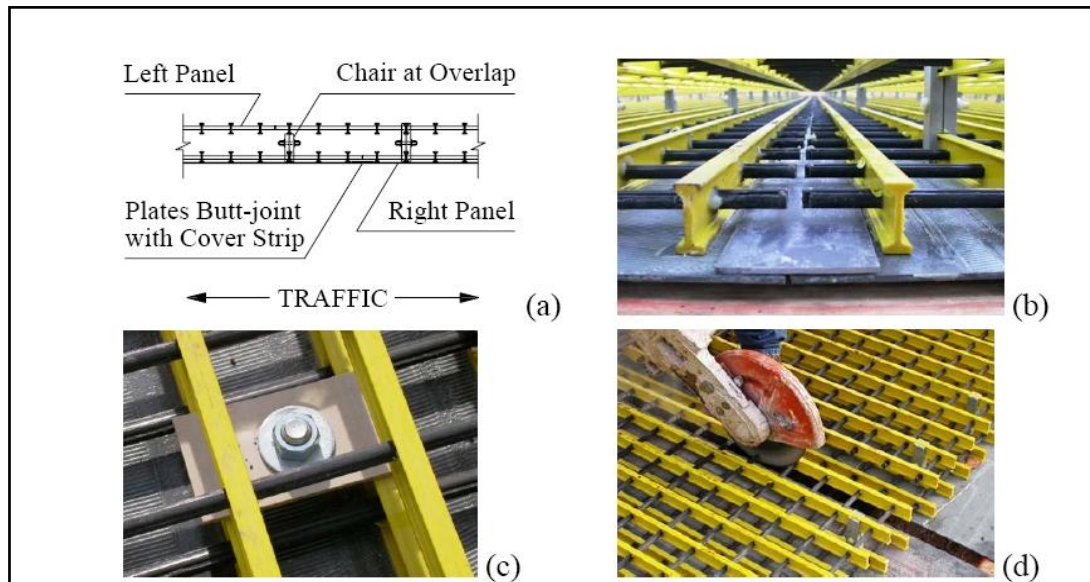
Gridform detailing: panel-to-panel overlap connection (a, b); anchoring to girder (c); and cutting of end panels at expansion joint (d). (Matta et al., 2004)
